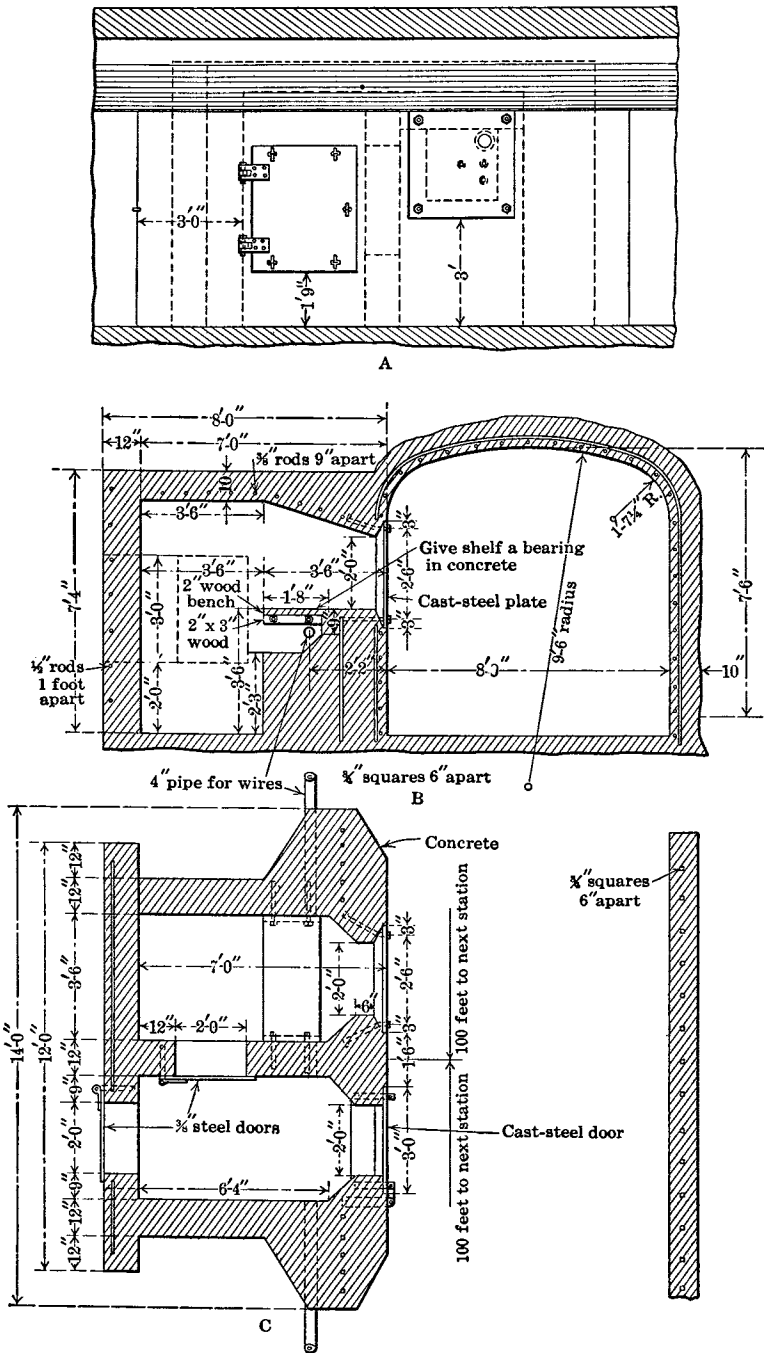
Construction of instrument chamber: A, front elevation; B, vertical section; C, plan.
